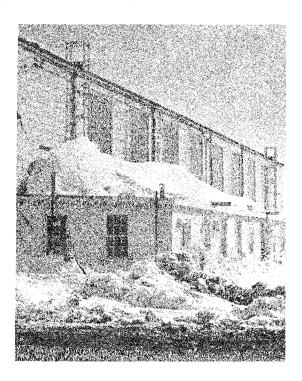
Example of a deep drift (max load = 238 psf) on a flat one-storey roof west of a large flat roof in Quebec City. A similar roof east of the building also carried a deep drift (max load = 221 psf). (Photo courtesy of M. Drouin.)
